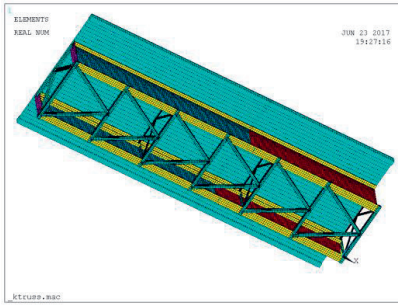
Bridge segment, from beneath, horizontal K-truss, RHS 200 x 200 x 10
